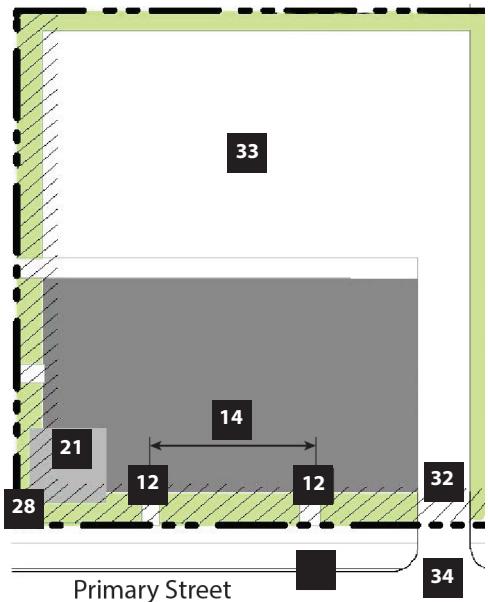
General building siting diagram shown with corner tower and rear vehicular access. Not to scale.
